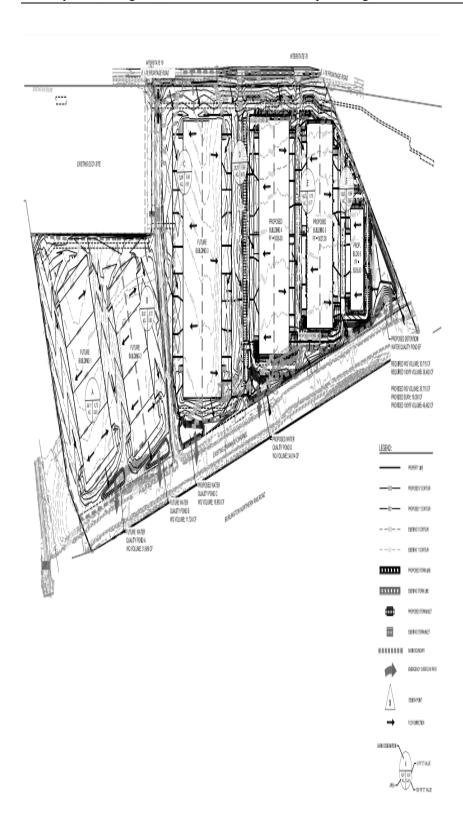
Site Specific Maintenance Plan (Use UDFCD Recommendation)
